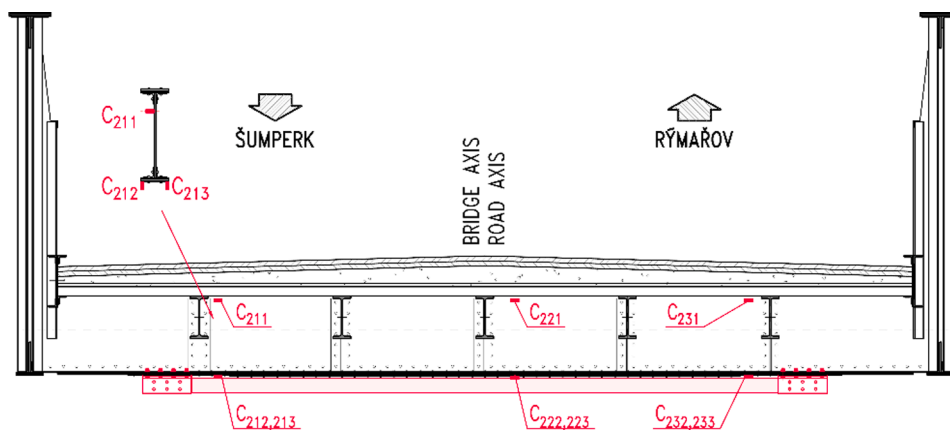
Layout of the strain gauges on the strengthened bridge girder.
